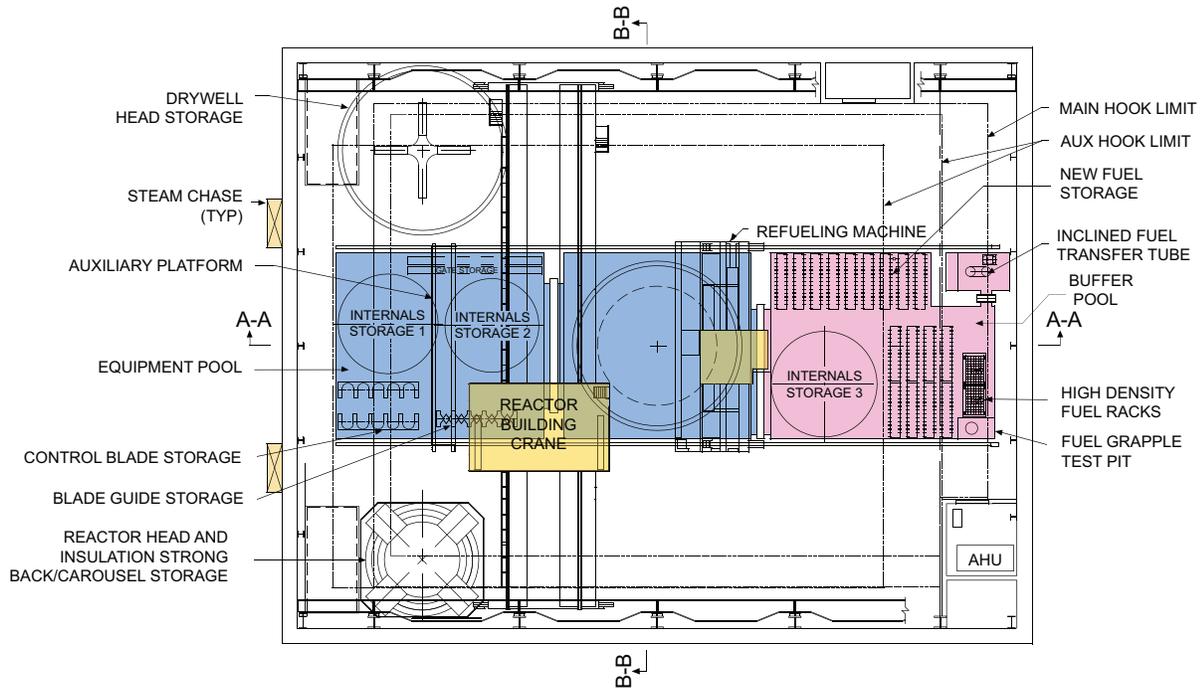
ESBWR Reactor Building Refueling Floor (5F)
